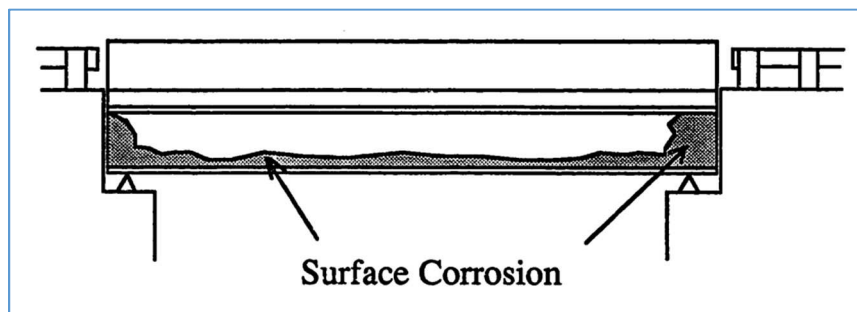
Typical corrosion locations on a steel girder bridge (Kayser, 1988)
